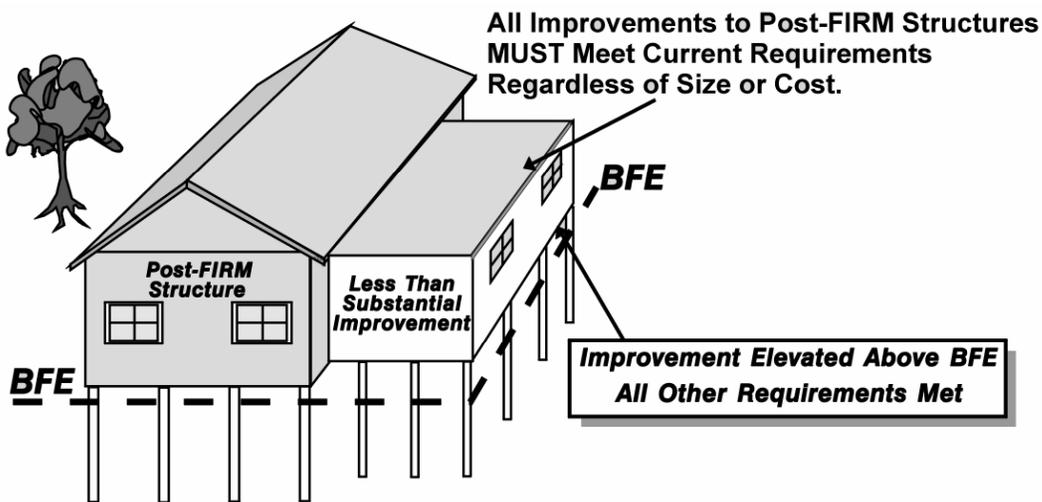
Small additions to post-FIRM buildings must be elevated.
